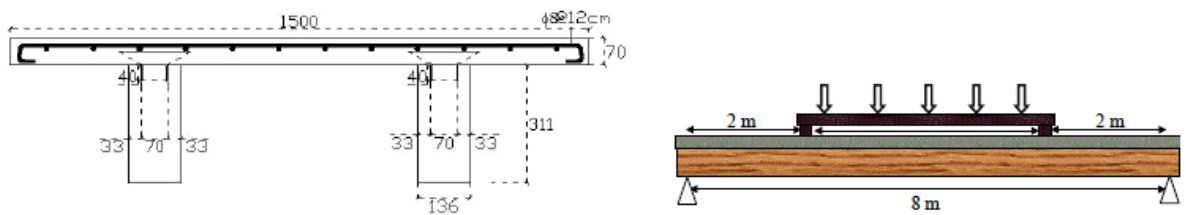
Timber-concrete composite section (left) and loads disposition (right)
